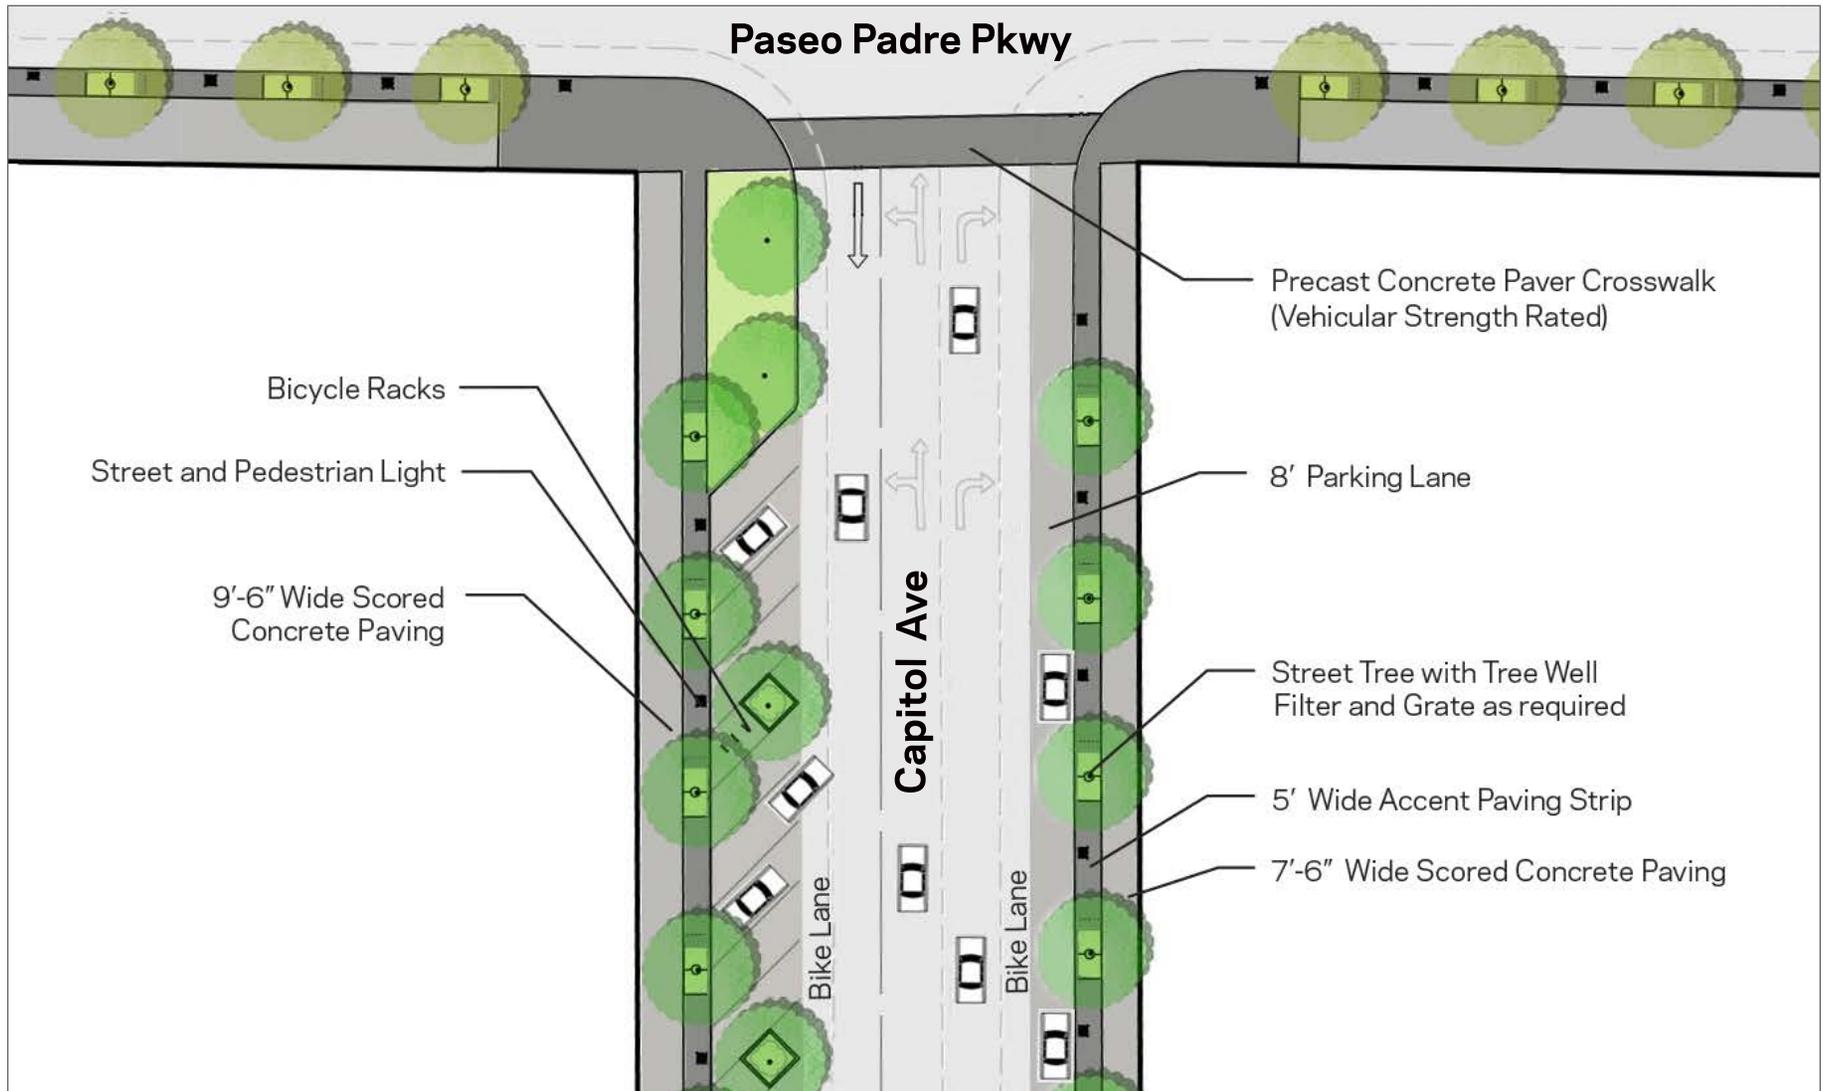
Capitol Avenue: East Segment - Street Plan (top)
